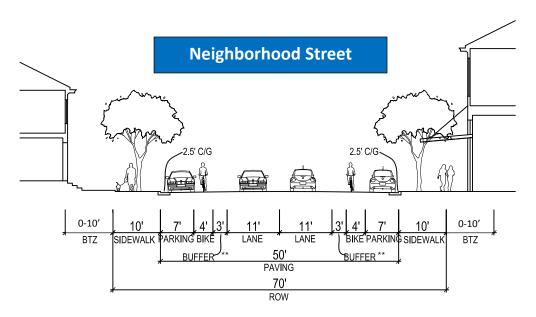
Street Type 3: Neighborhood Street Cross Section
